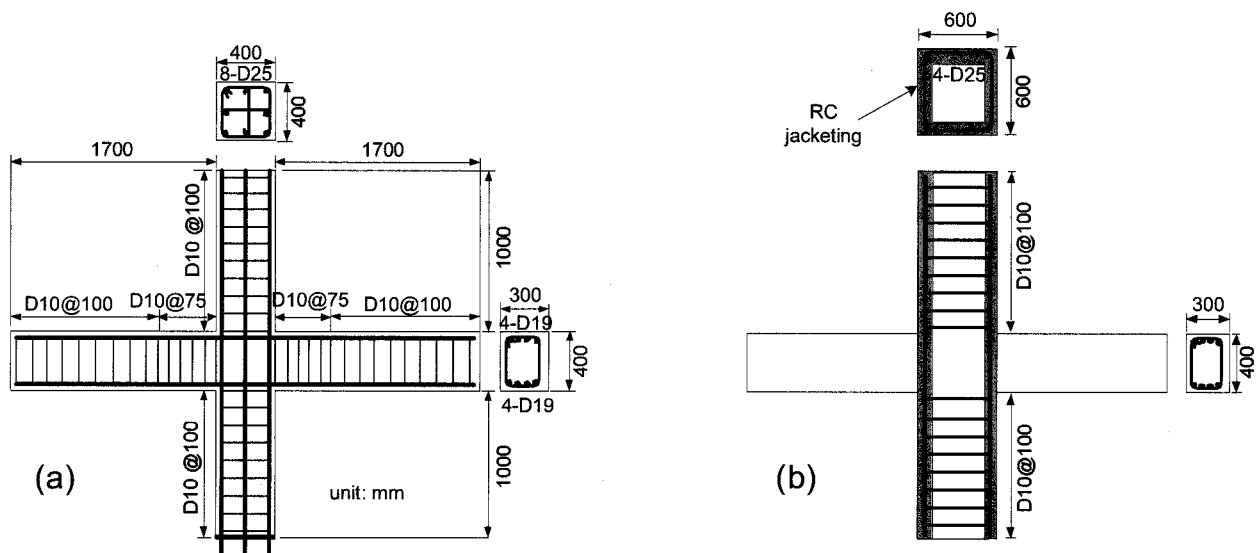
Details of Tested Beam-Column Joints: (a) As-built Unit JI1, and (b) RC Jacketed Unit JIR1.
